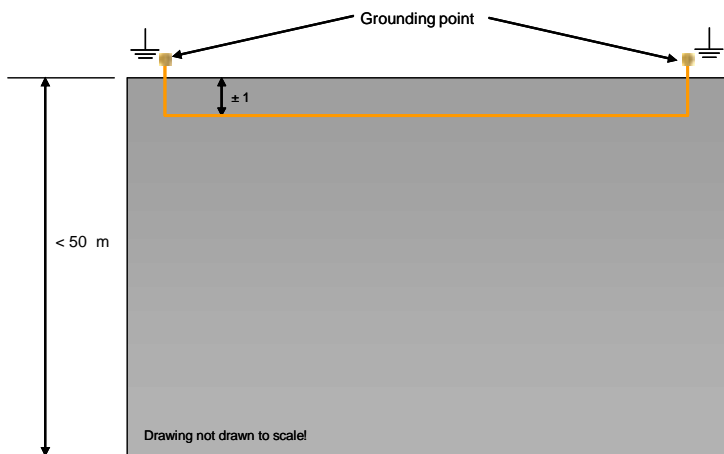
Copper strip layout for rooms > 50 m<sup>2</sup>, alternative A
